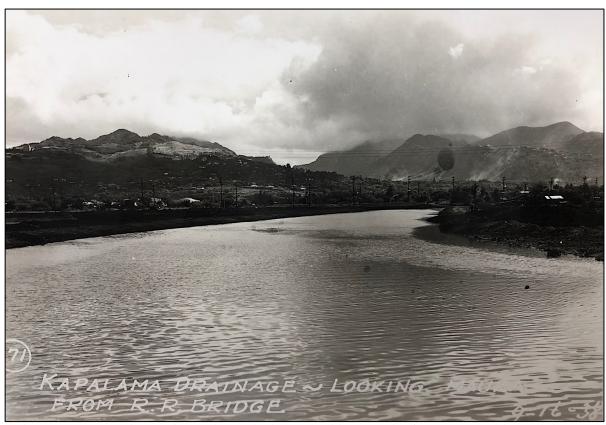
1938 photo of Kapālama drainage looking mauka from R.R. Bridge (Bishop Museum Archives SP20711,3)
